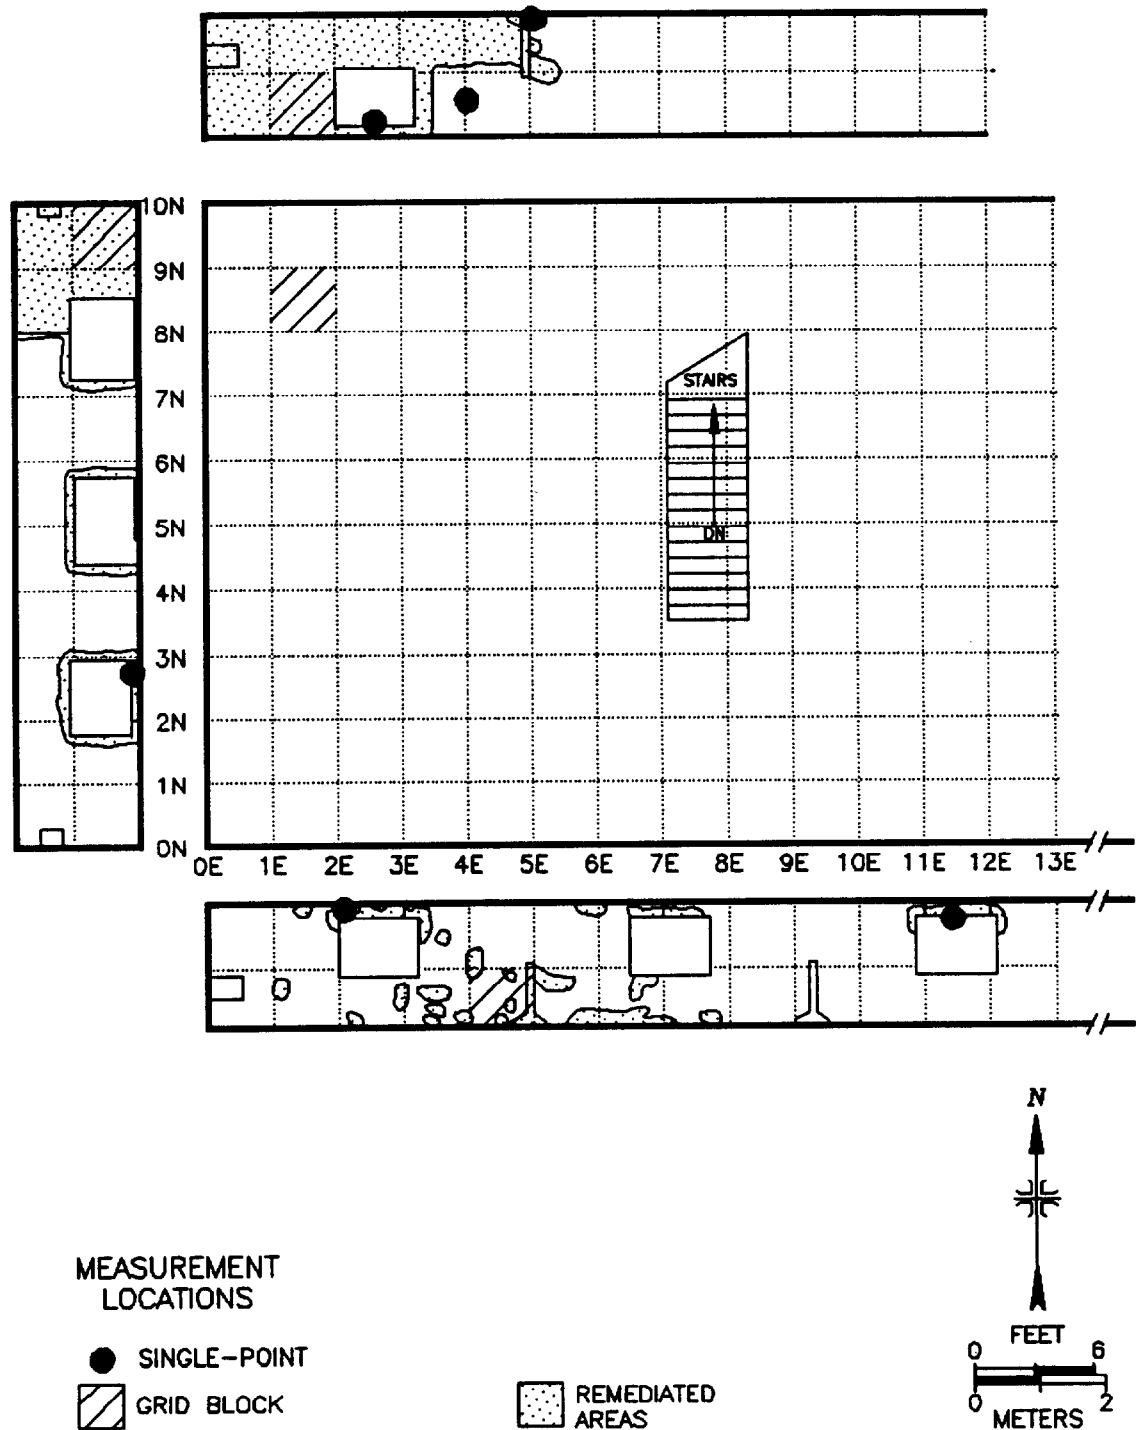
Building 17, Second Floor Supply Storage Room, West End – Measurement and Sampling Locations
